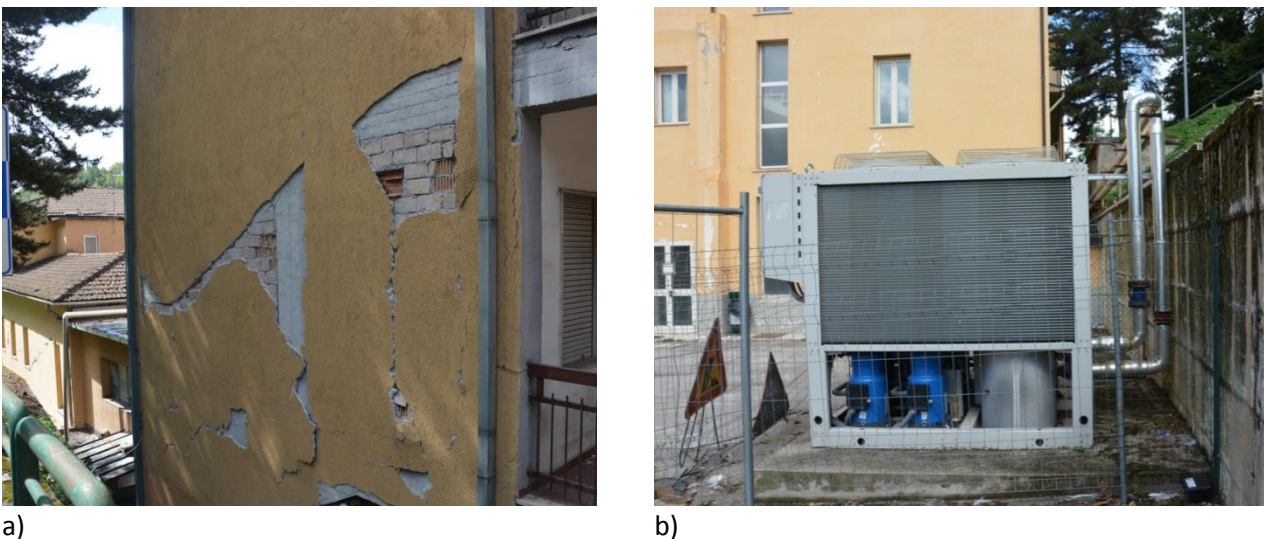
Amatrice hospital: a) Damage to the RC building and b) undamaged steel HVAC component
